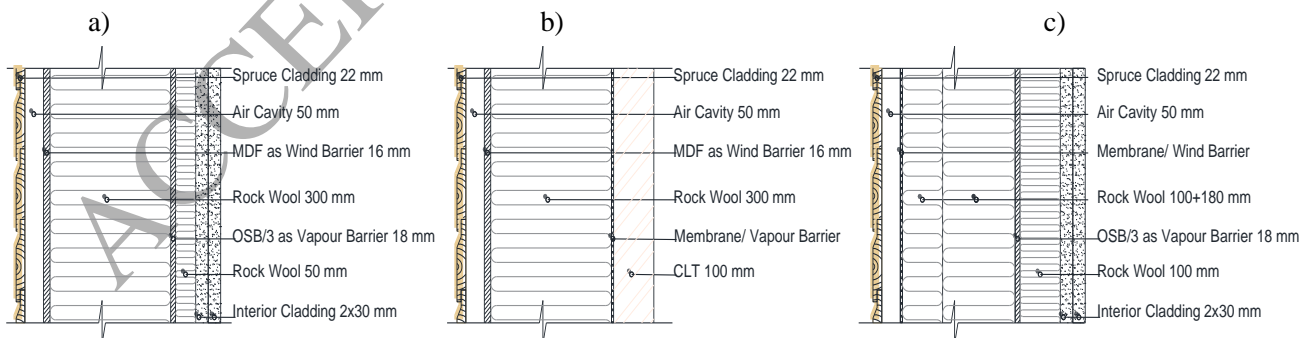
Configuration of the wall constructions: a) AWI 05, b) AWh 01 and c) AWI 01.
